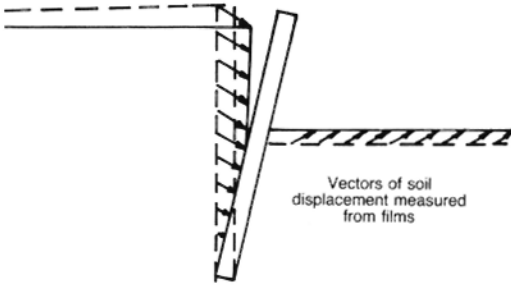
Collapse mechanism for a water-filled crack behind unpropped walls
